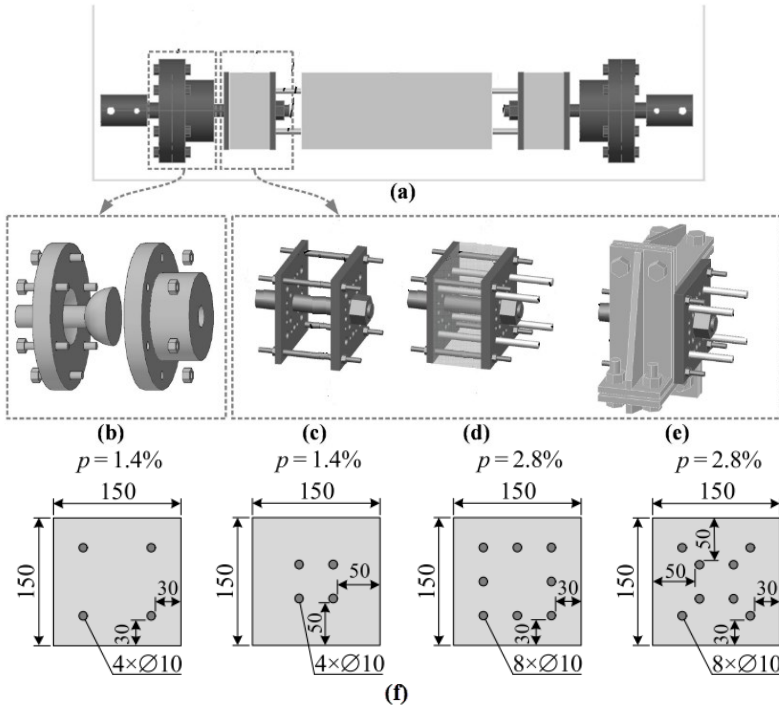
Multi-bar equipment test for tensile RC elements: (a) Concrete specimen with connection devices (b) spherical hinge (c) anchorage joint plate (d) reinforcement bar located in the anchorage joint plates (e) steel bracket (f) reinforcement arrangement over the cross-section [16].
